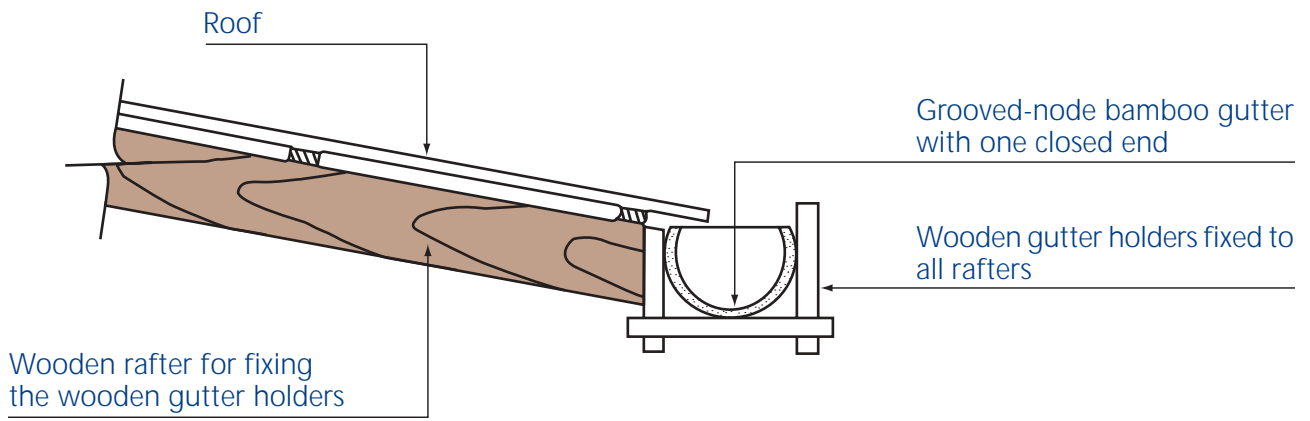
Fix the bamboo gutter with wooden gutter holders to wooden roof structure without eaves.
